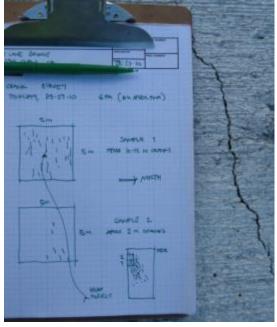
Within 24 hour of concrete placement - deck crack survey photos.
